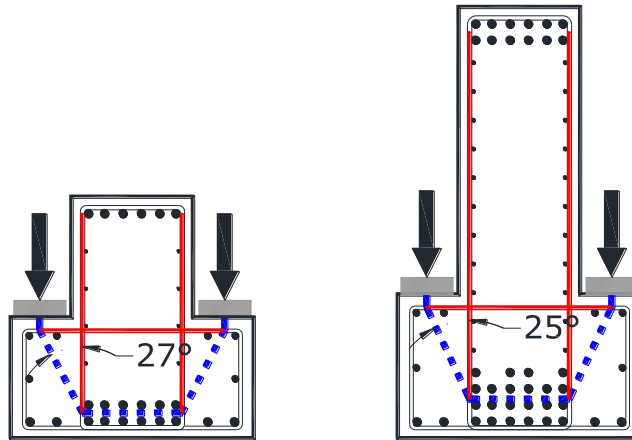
Typical cross-sectional models for 42-in. specimens with deep ledges and 75-in. specimens with shallow ledges
